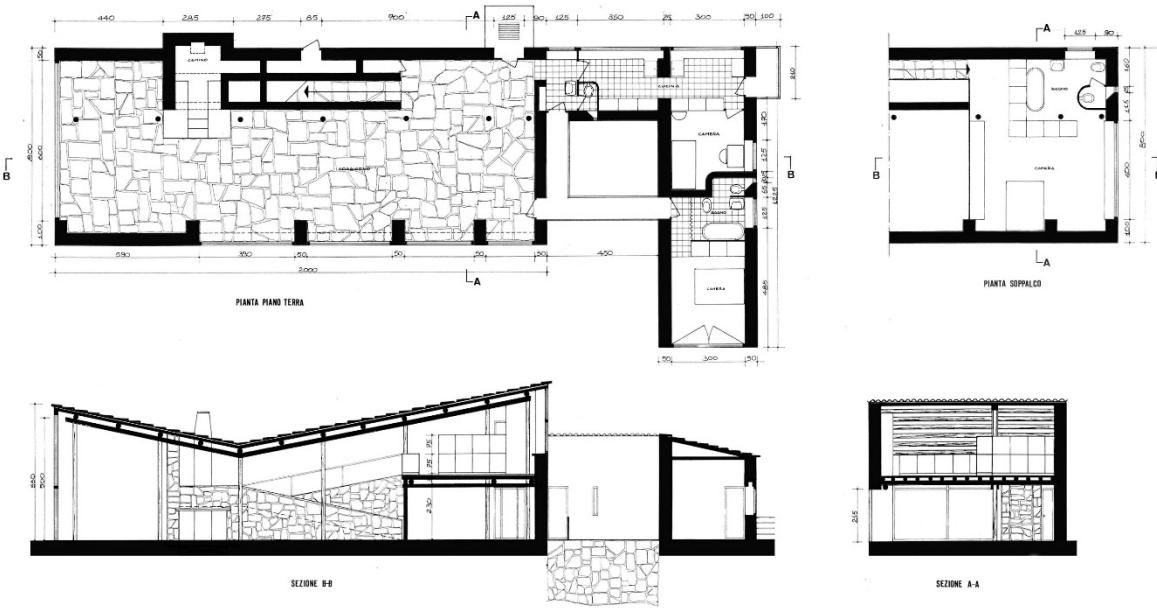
Maison Errazuriz – Floor plans and sections © Aldo Ripamonti
